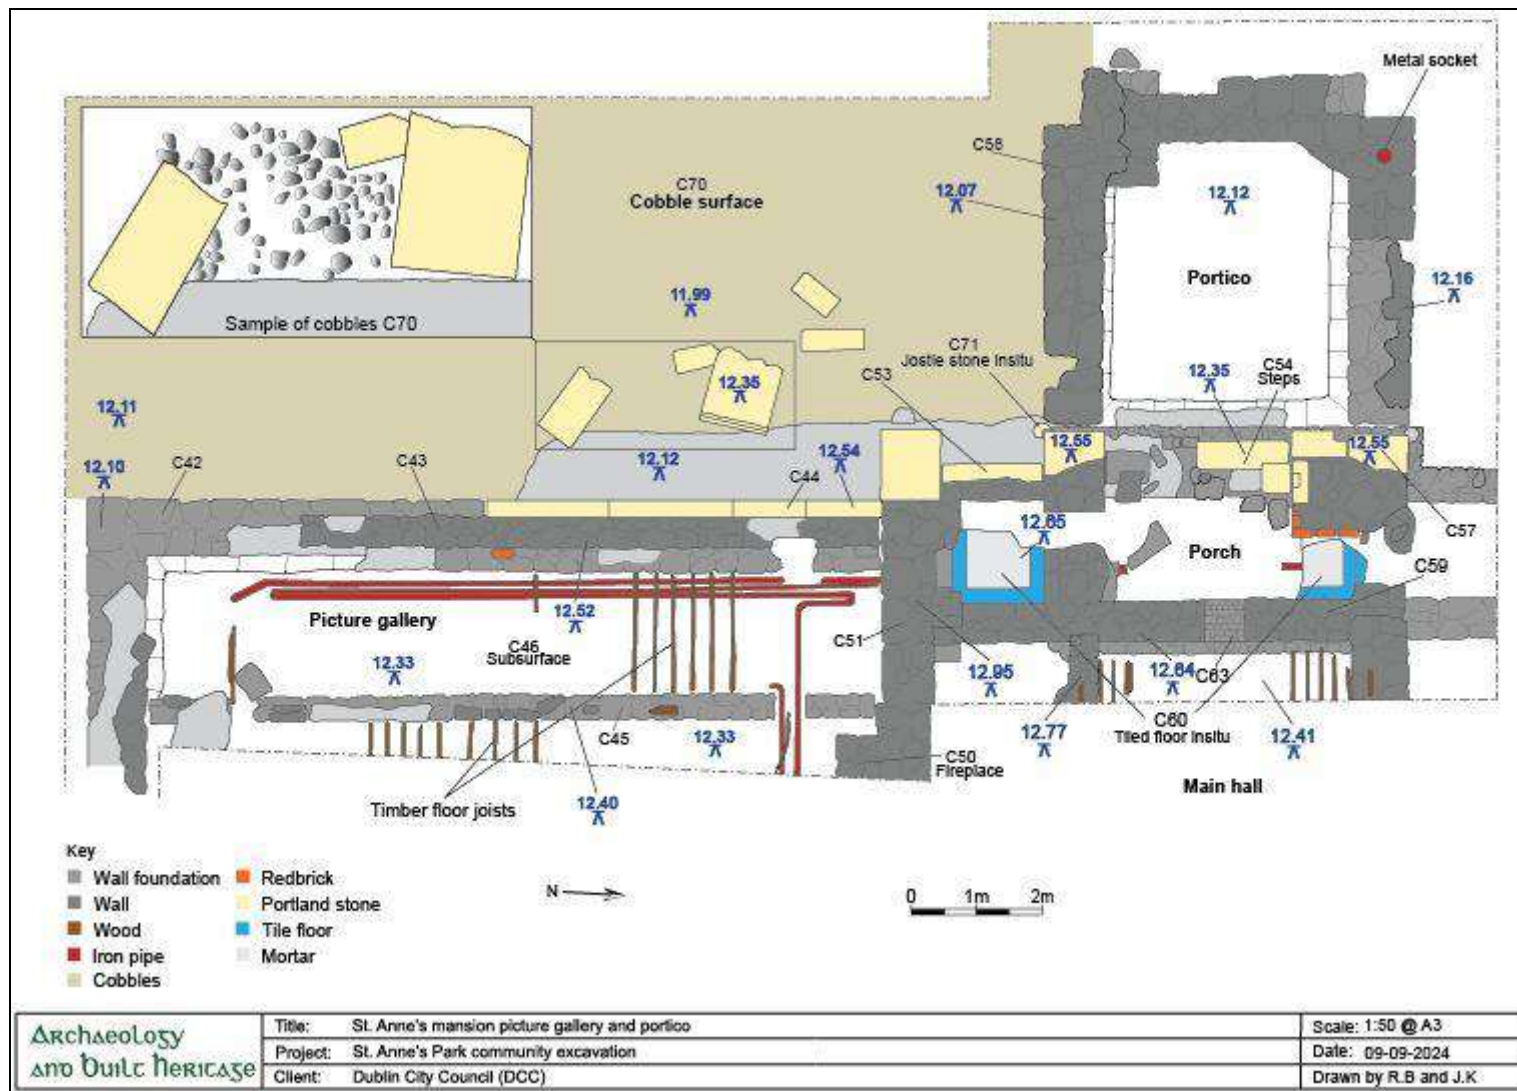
Plan of 2024 community excavation trench (ABH Ltd.)
